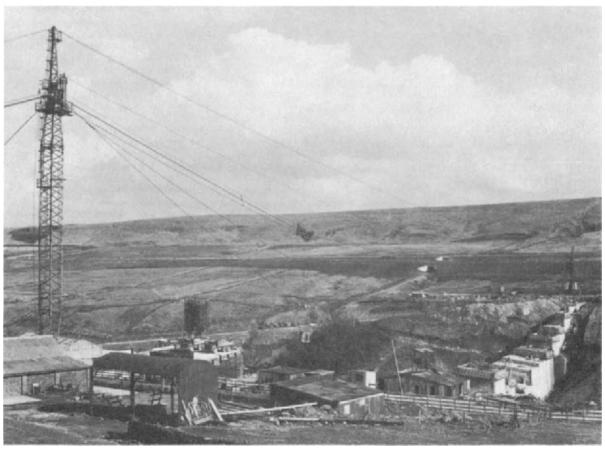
Cableway with constant-attitude concrete bucket used in dam construction. (Courtesy: J. M. Henderson & Co. Ltd)
